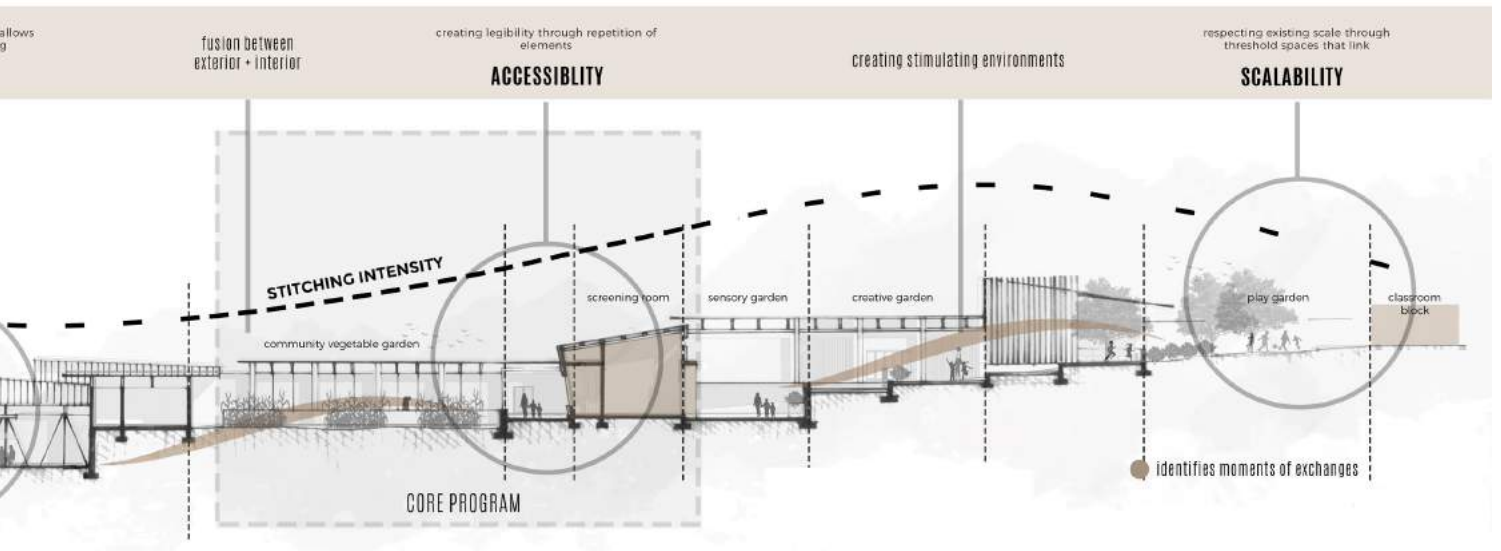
Iteration four section exploration showing connection between existing clinic to school with the new facility as linking element (Author 2018)
